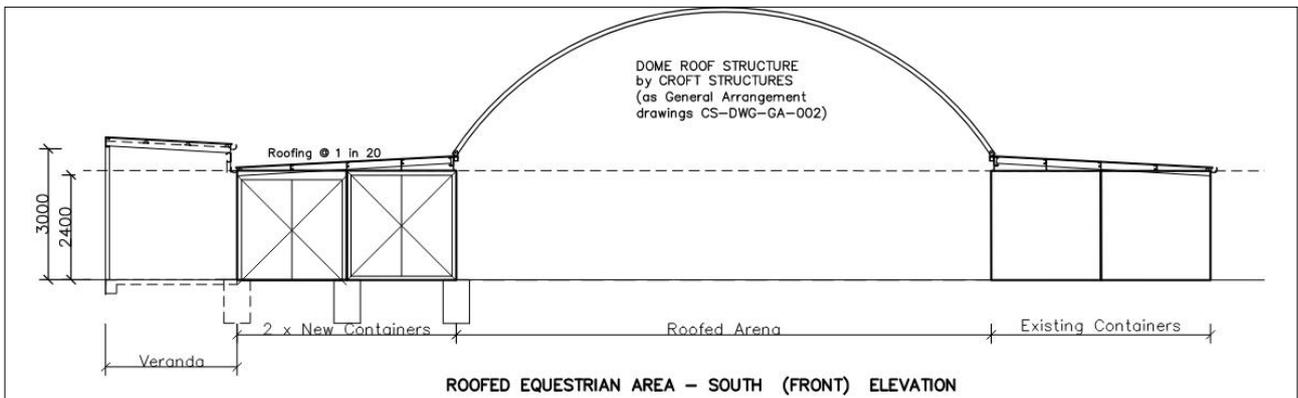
South elevation (road frontage) of equestrian facility (Tas Laughlin, 2021)
